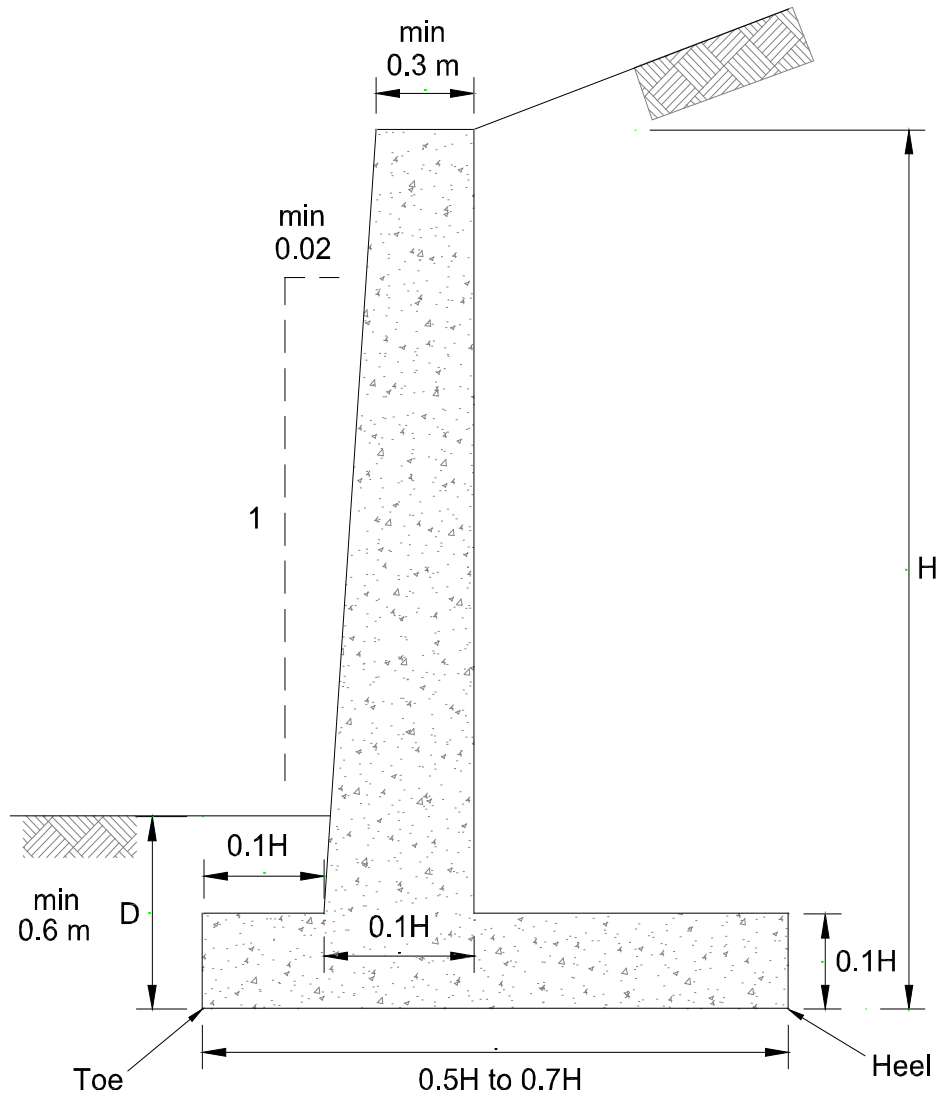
Typical dimensions for different components of cantilever retaining wall.
